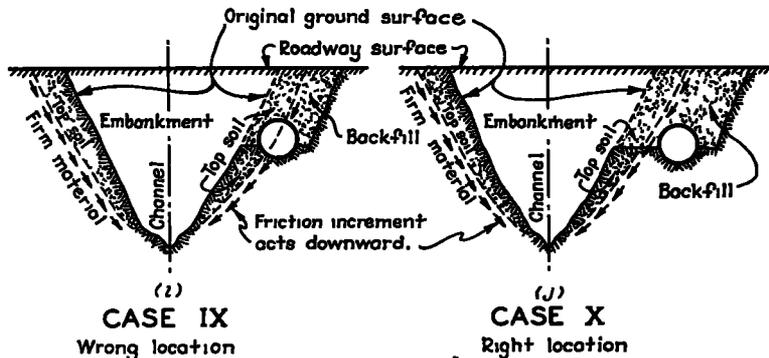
Right and Wrong Way of Installing Culverts in Sidehill Location
